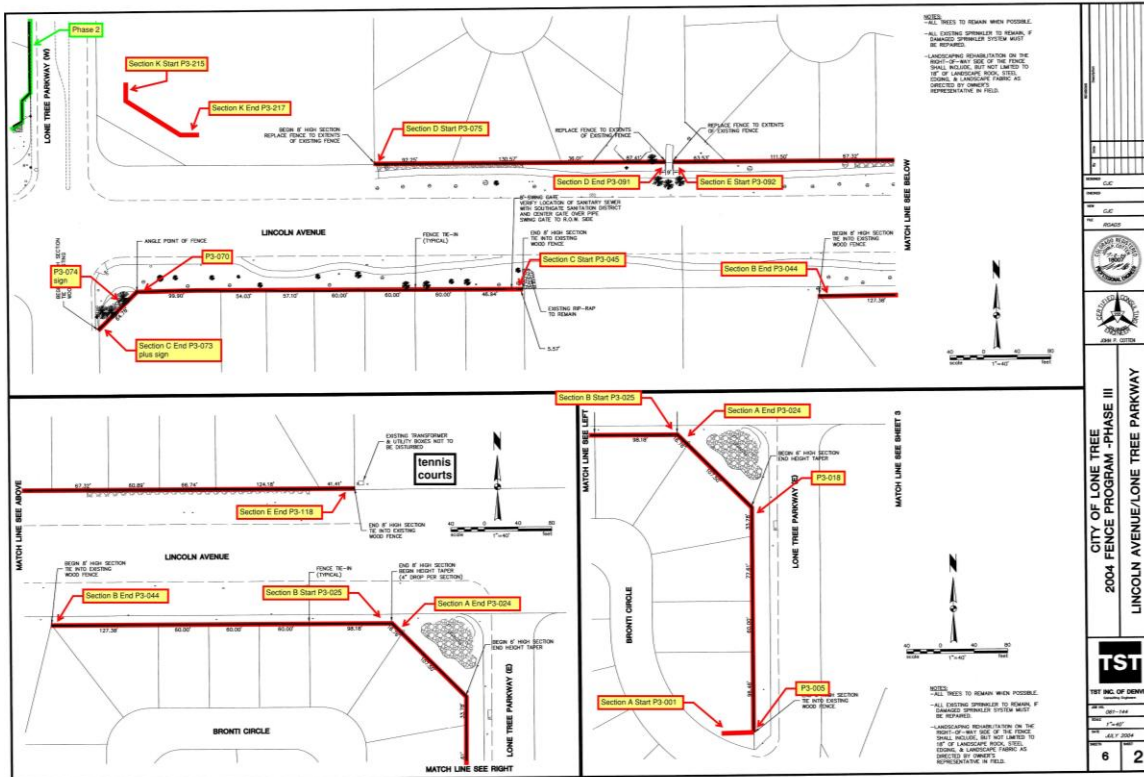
Sheet from the plan view original construction drawings, showing a portion of Phase 3 with the beginnings and ends of each Section labeled.
